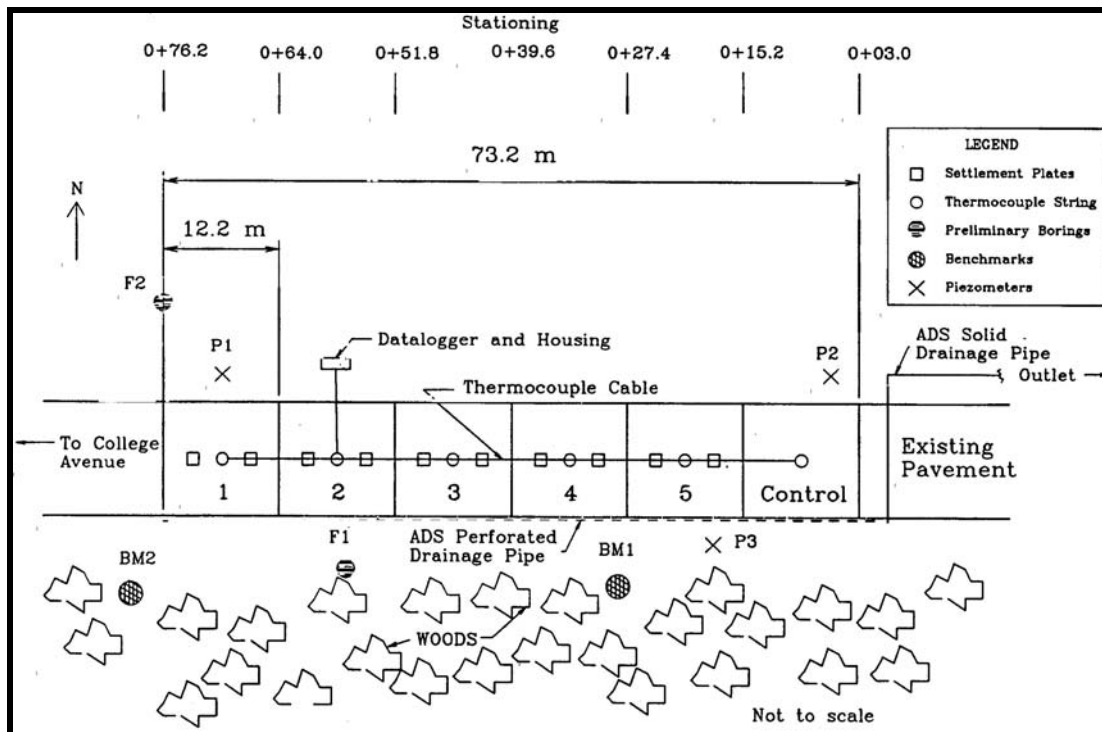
Plan view of test sections at Witter Farm Road (Lawrence, et al., 2000).
